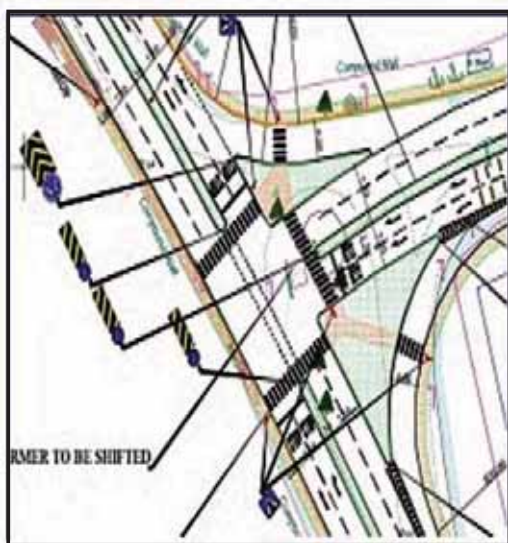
Long term proposal of Adoor high school and bypass junction
